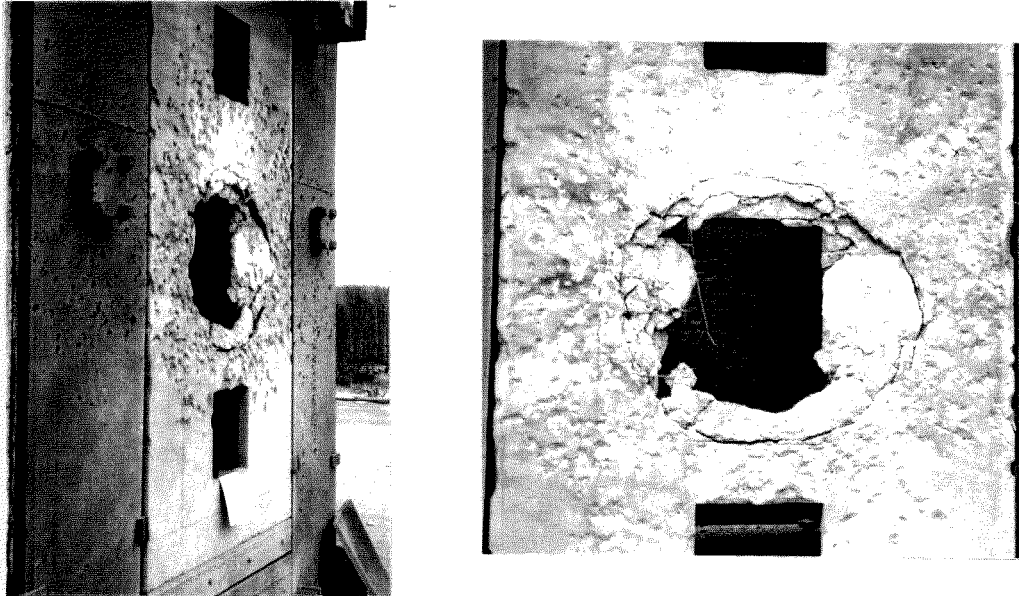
Damage after blast, heavy reinforcement, with inner walls; Forsén and Edin (1991).
